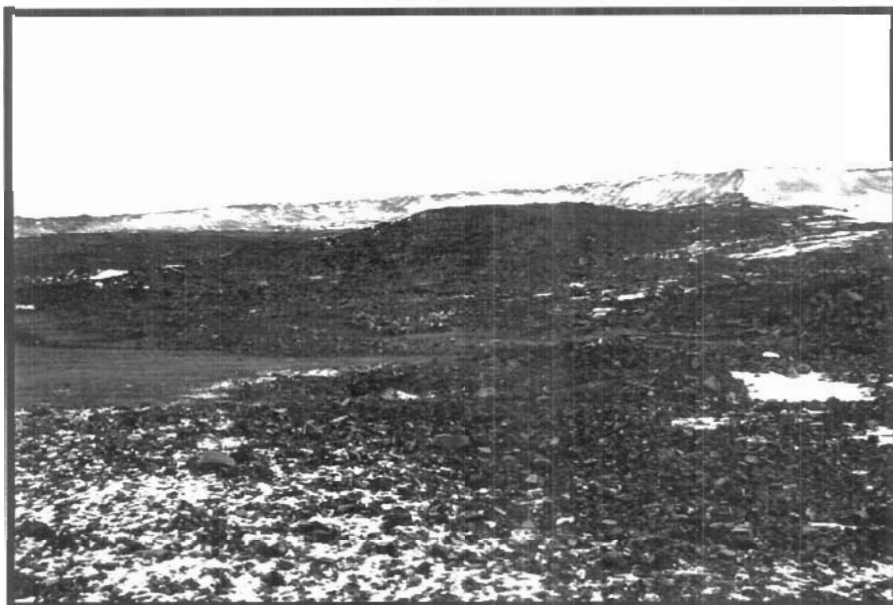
Berm of excavated shale with oversteepened slope in New Quarry. This slope should be flattened to conform to the remaining pit side slopes.
